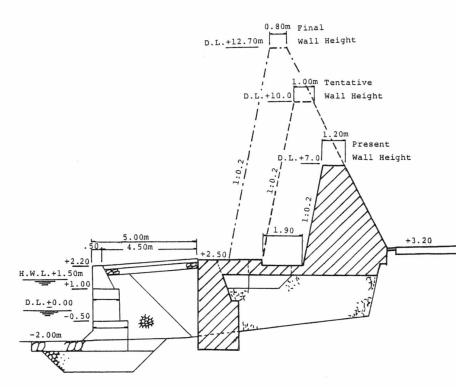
Stage improvement plan of a tsunami wall. [Fukuchi and Mitsuhashi, 1981]
